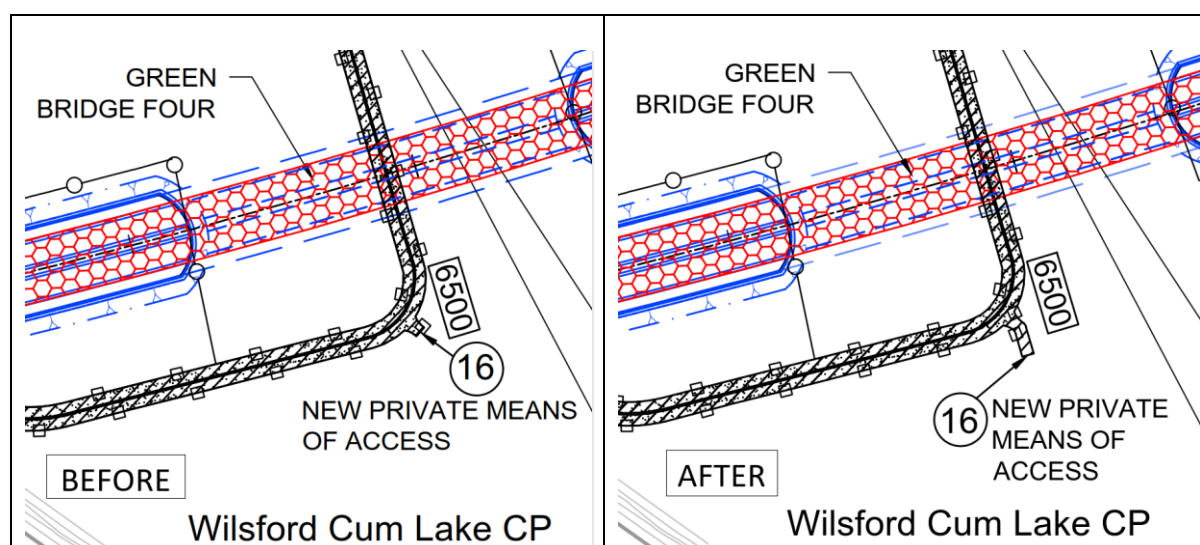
Extract from Rights of Way and Access Plans [APP-009]
